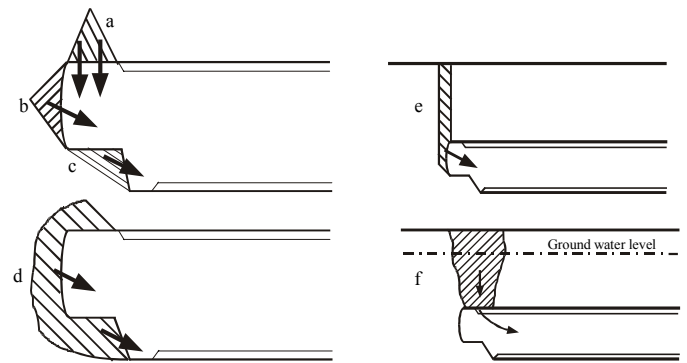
Ground collapses in the heading of NATM tunnels (adapted from HSE 1996)
